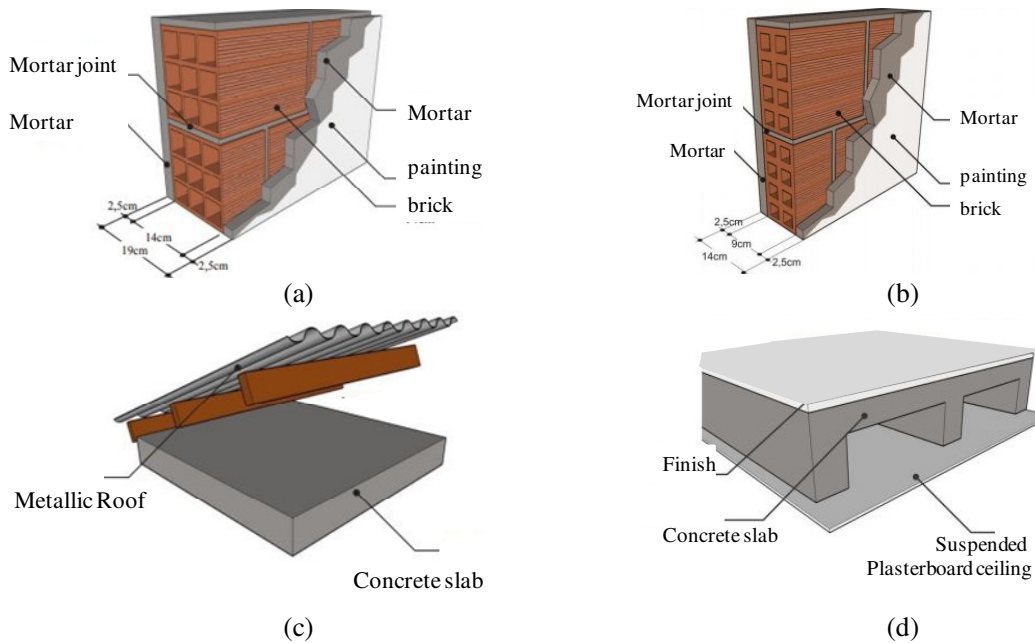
External Wall (a), internal wall (b), multi-plane roof (c), concrete slab roof (d)
